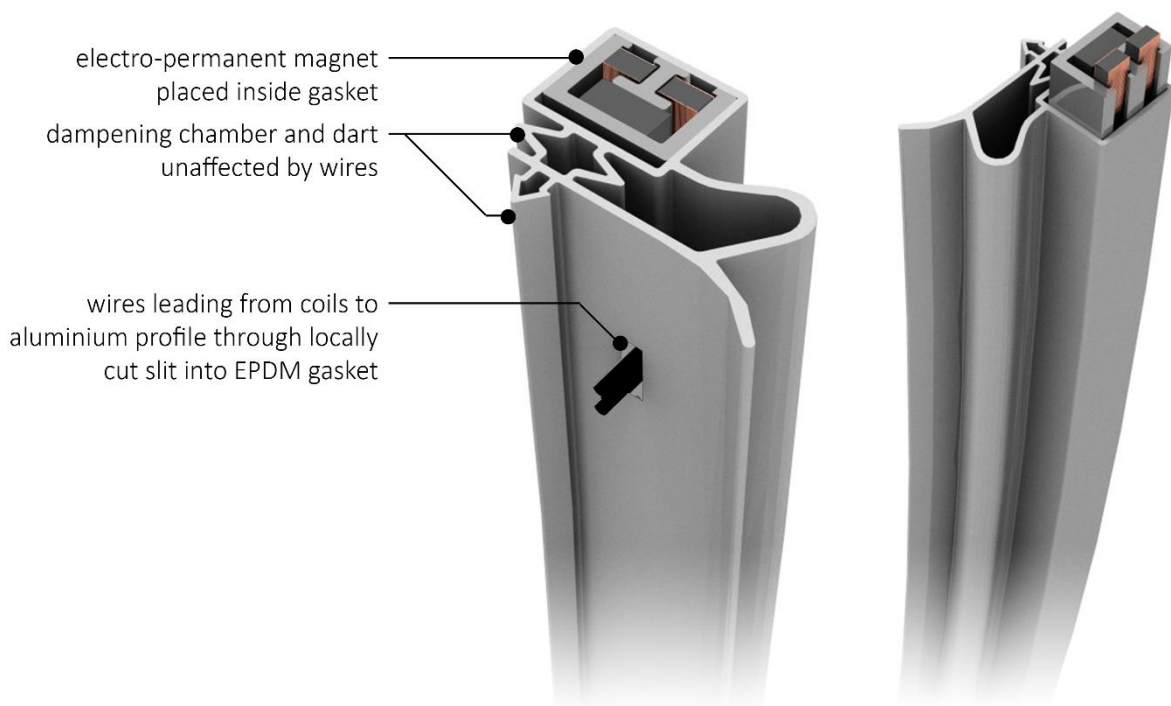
Left: 3D-illustration of gasket at midpoint (wire connection), right: front isometric view
